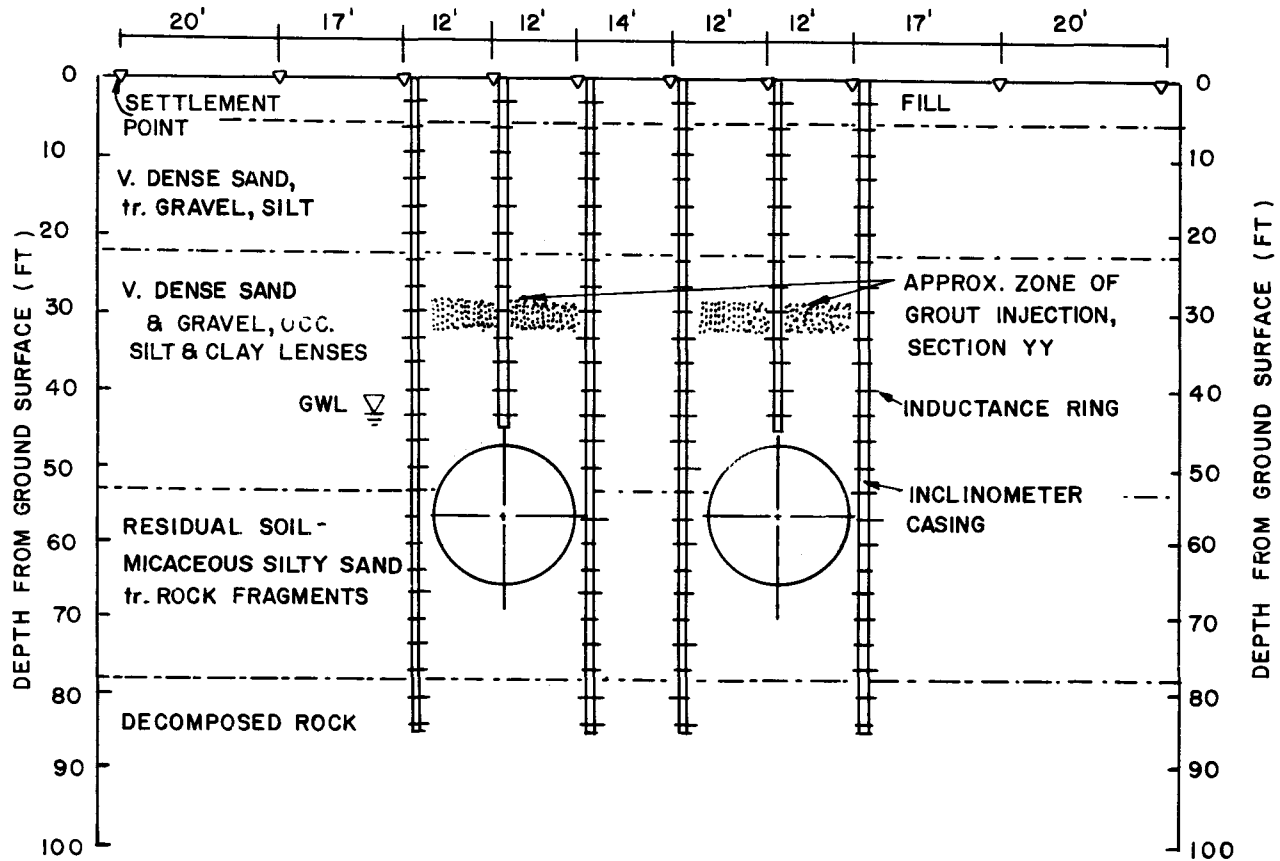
Plan of Test Section, Bolton Hill Tunnels, Baltimore, Maryland
